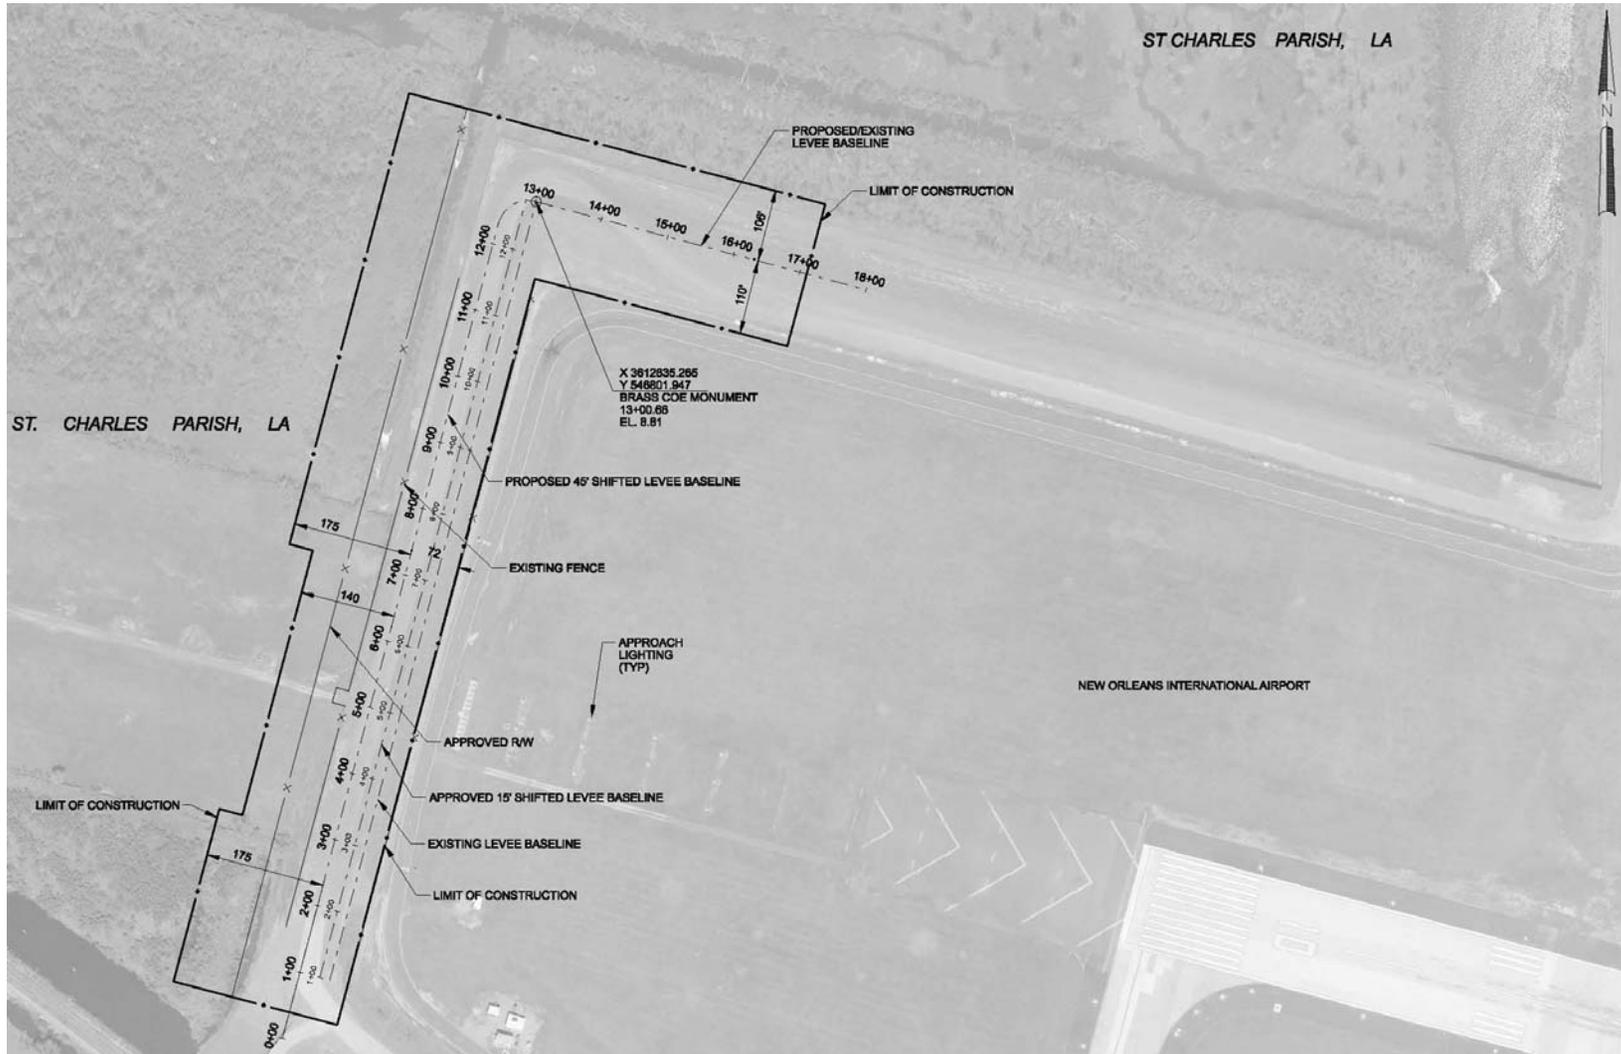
Plan view of LPV 03d showing the existing, approved and proposed levee centerlines and the approved (in IER 1) and proposed ROW (approx. 2.5 acres).
